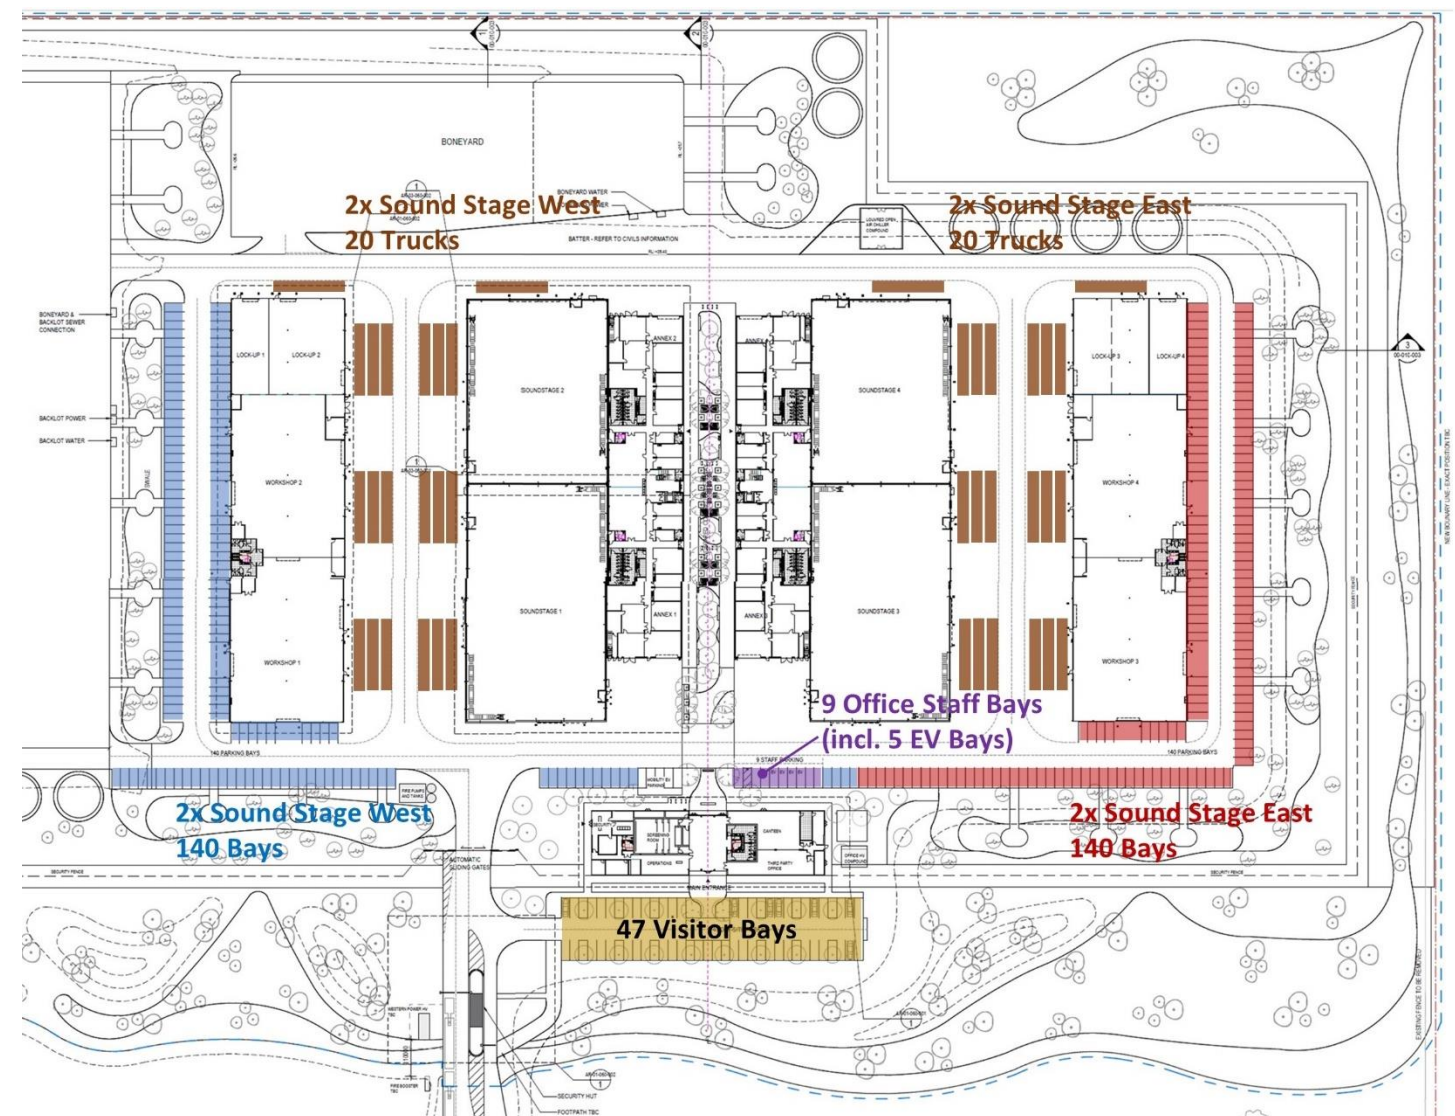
Indicative allocation of parking across the proposed Malaga Site (source: Hassell, January 2023)
